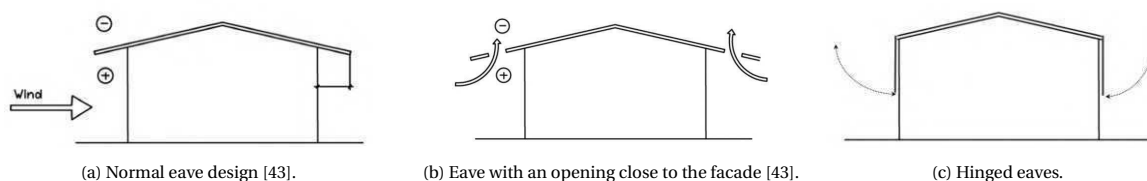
Wind pressure development around different eave designs and a hinged eaves as solution.
